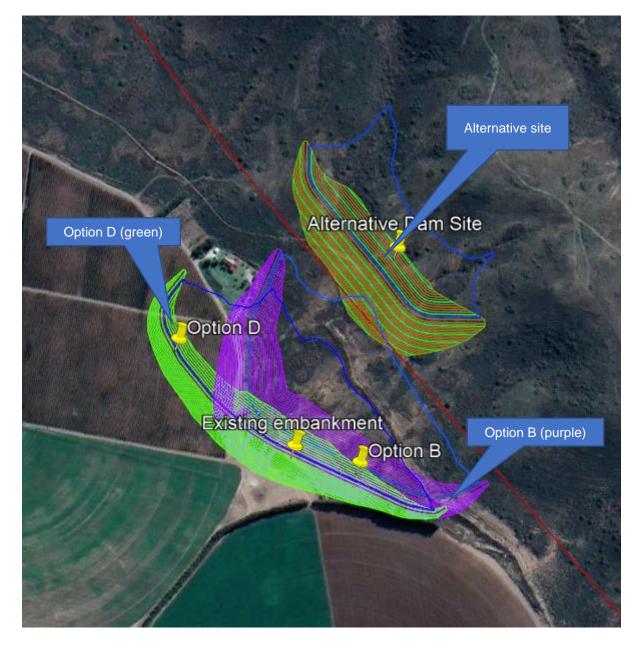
Aerial layout of dam options B, D and alternative dam site
